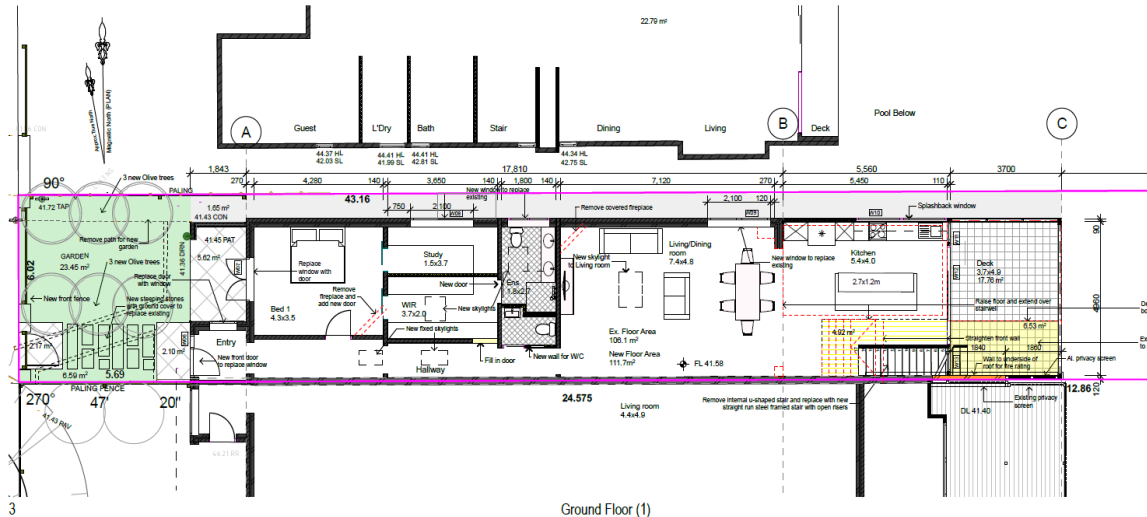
Photo from submission from BBF Town Planners on behalf of the owners of 26 Ocean Road, Manly
